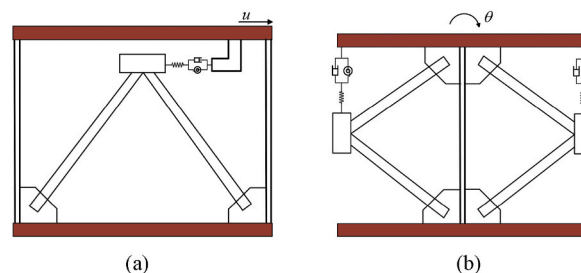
Common structural damper installation methods (a) Damper arrangement of shear structure; (b) Damper arrangement of bending structure.
